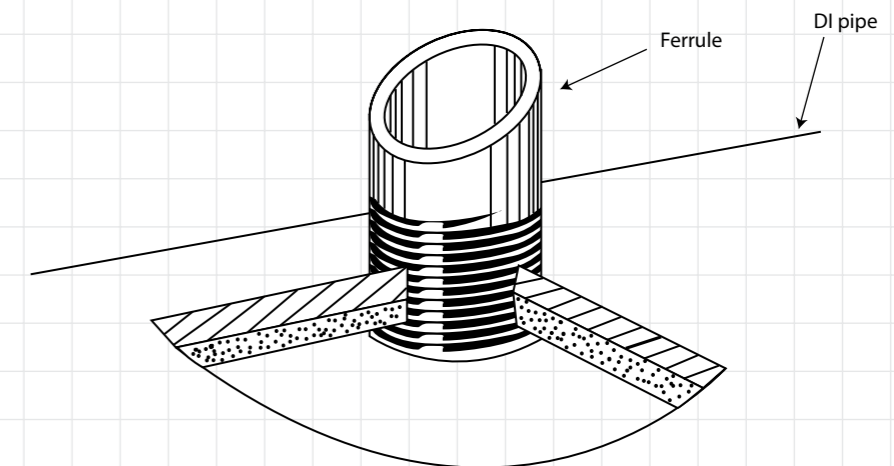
Threaded Tapping in Ductile Iron pipes.
